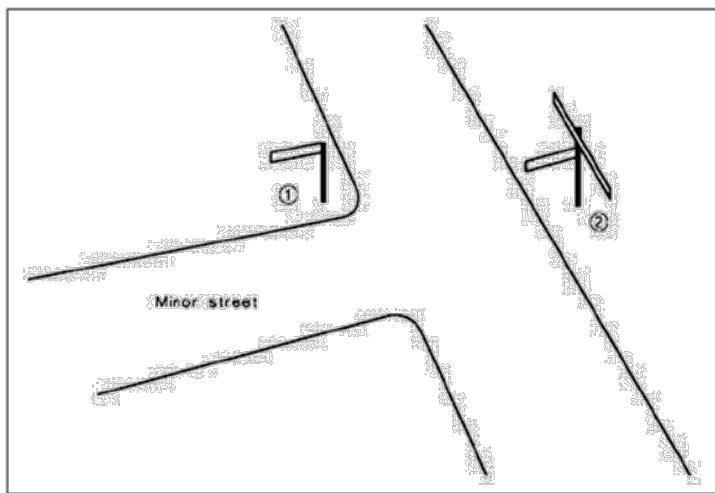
T-JUNCTION—MINOR STREET WITH UNDIVIDED MAJOR STREET
